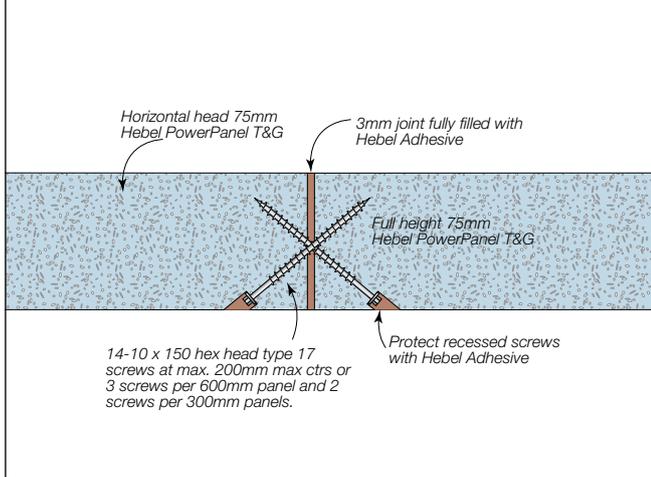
Door nib detail for widths 100-300mm - SECTION BB
